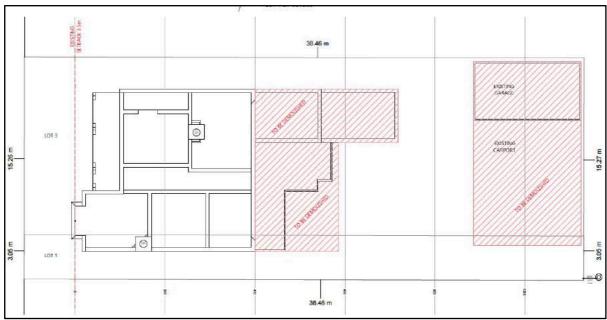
Extract of Demolition Plan (Source: Align Building Design 2020)
